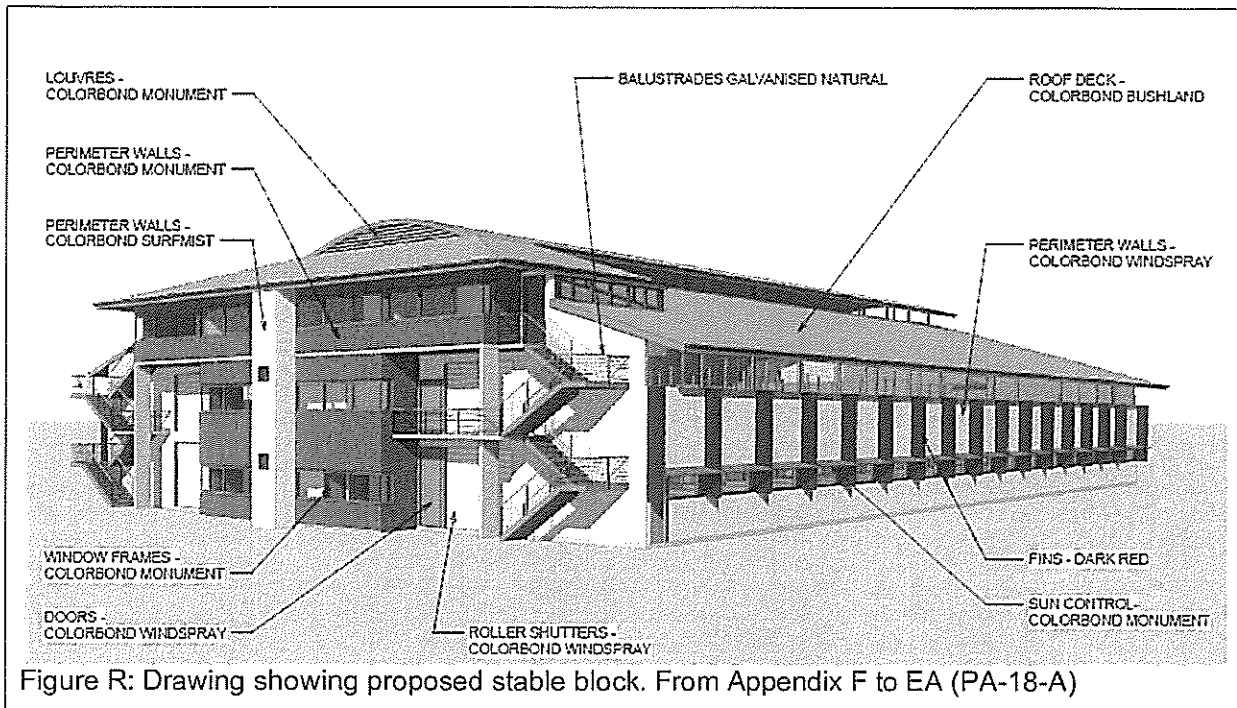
Figure R: Drawing showing proposed stable block. From Appendix F to EA (PA-18-A)
